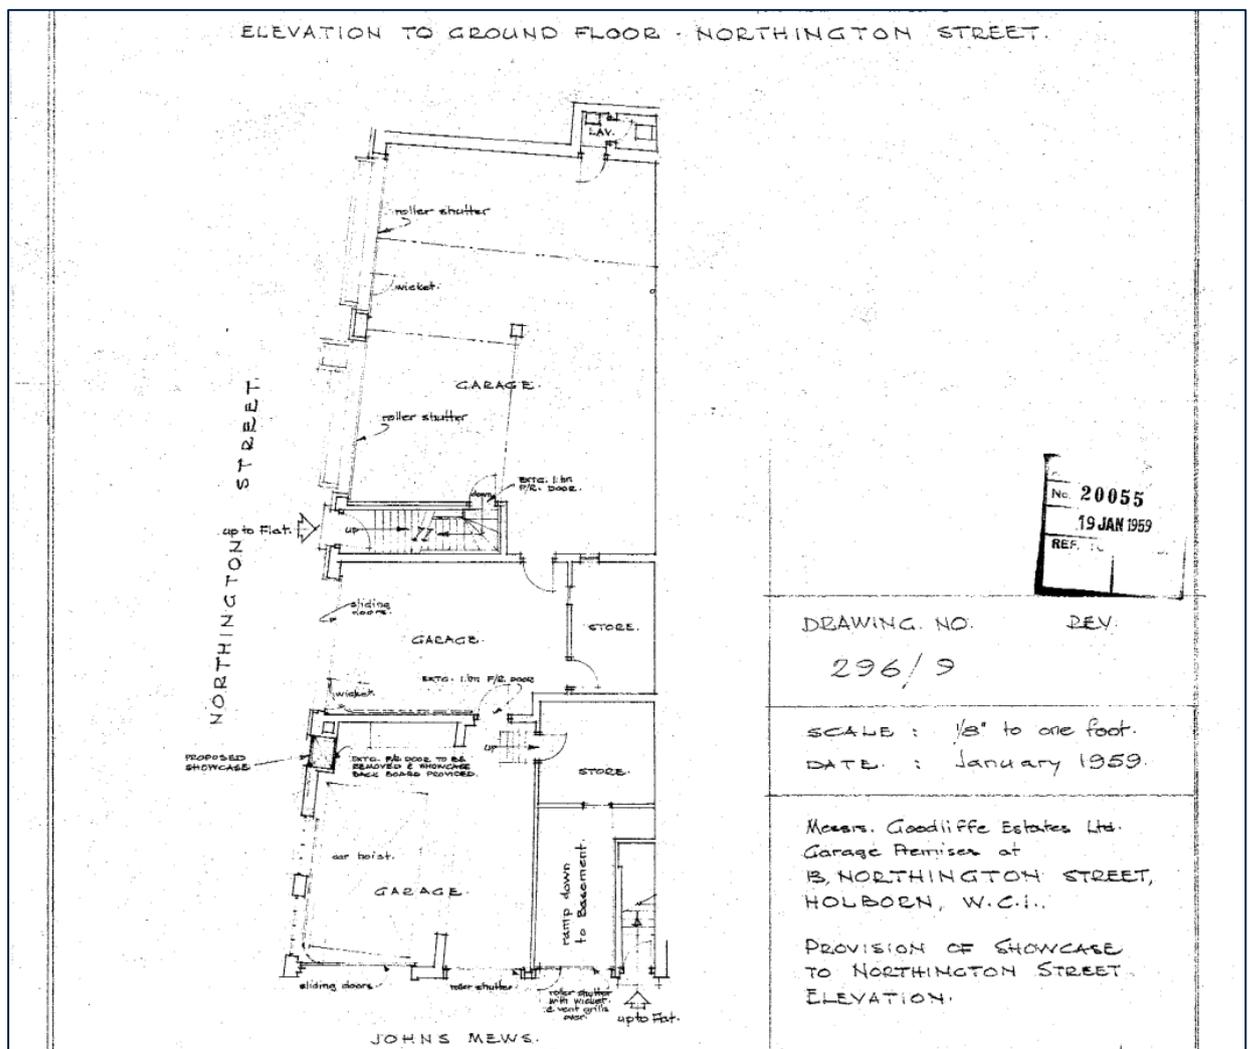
Extract of the 1959 architectural drawing for the whole of the building, which included the adjacent No. 13 Northington Street. The plan shows a ramp down to basement level, accessed from John's Mews, which has subsequently been filled in, leaving the present basement space.
